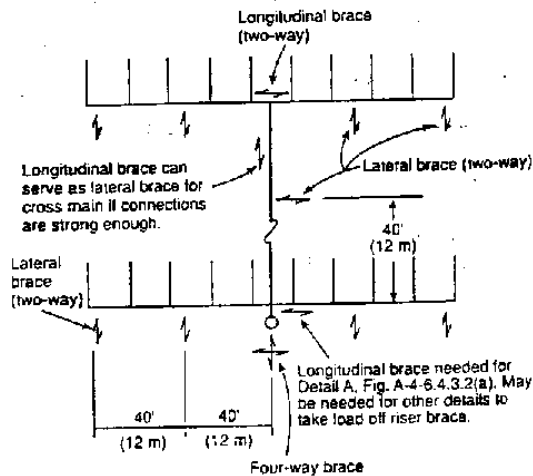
(b) Typical location of bracing on a tree system.
